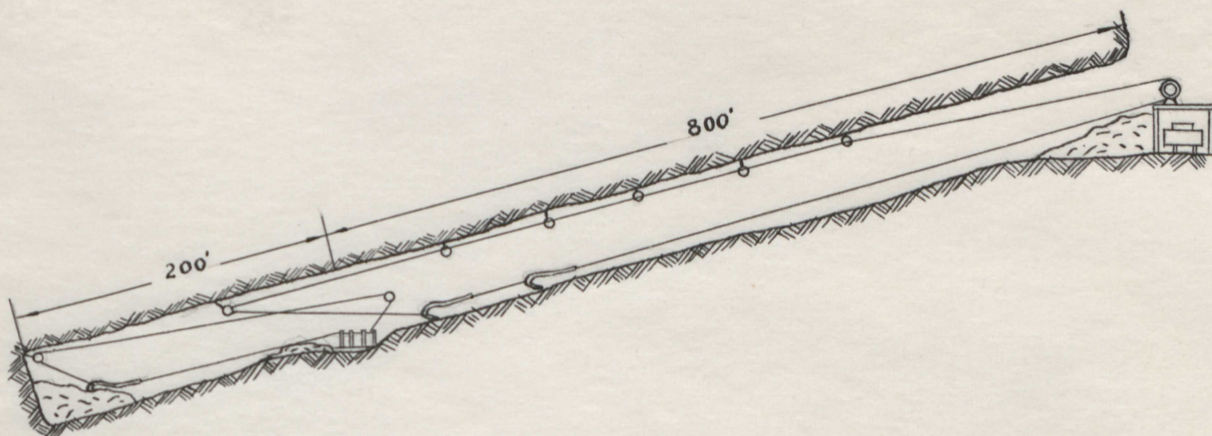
Use of Scrapers in Pend Oreille Mine.
